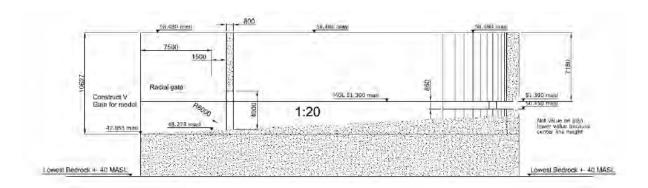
Proposed BRVAS abstraction works section E-E (Gravel trap right bank trap)
